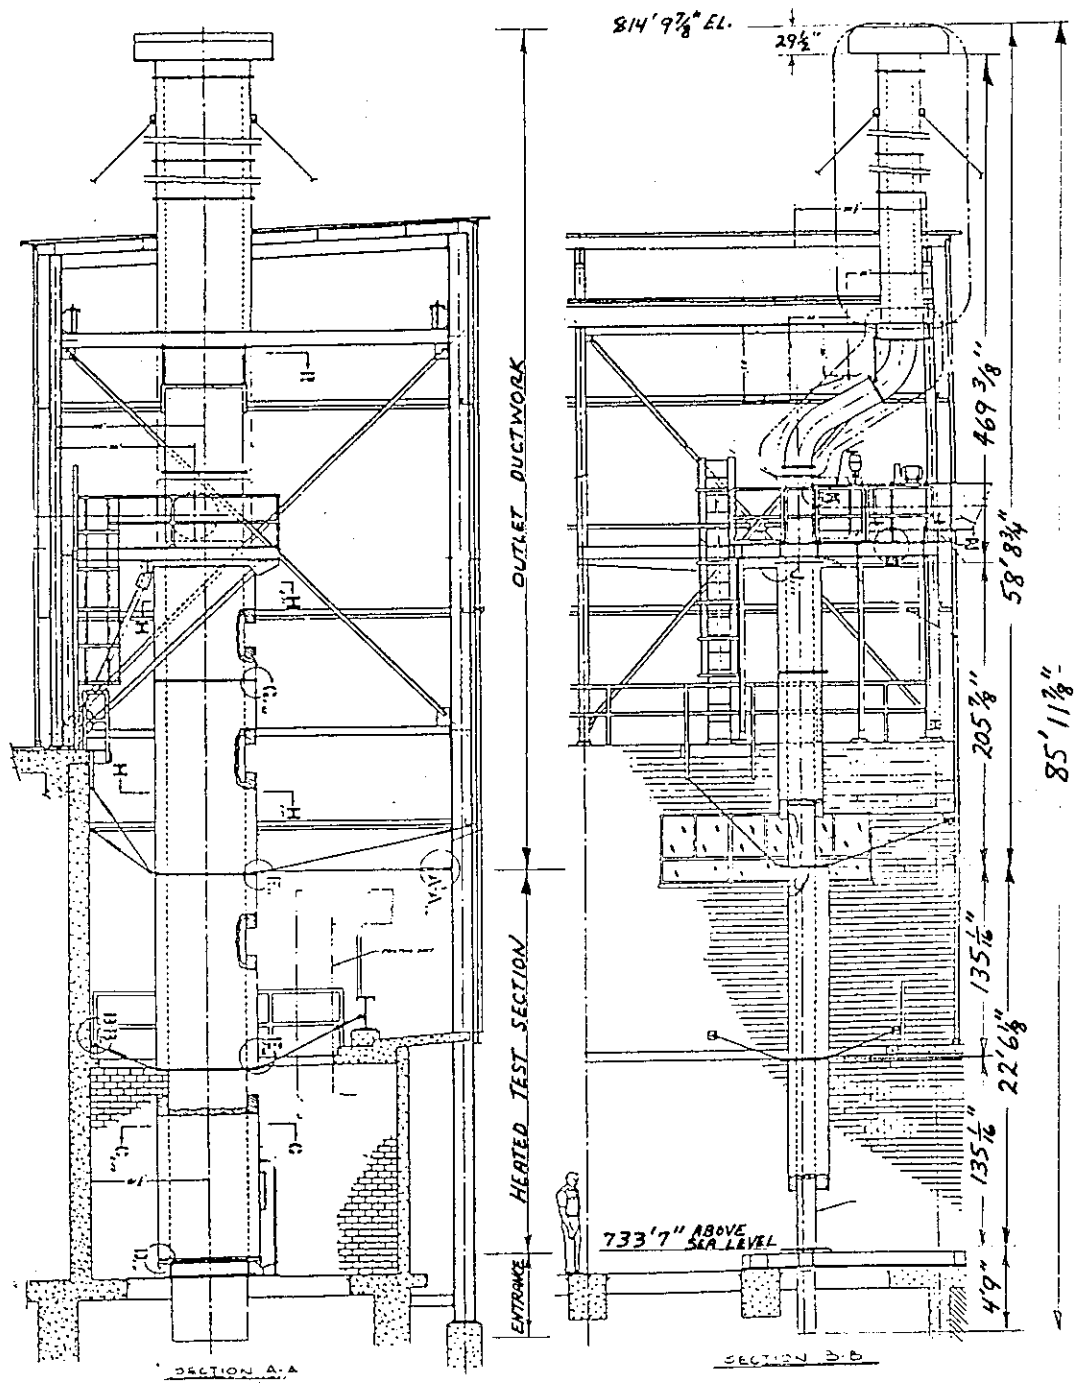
ANL Shutdown Heat Removal Test Assembly (Reduction of ANL Dwg. No. R0408-0004-DE, Sheet 1 of 4).
